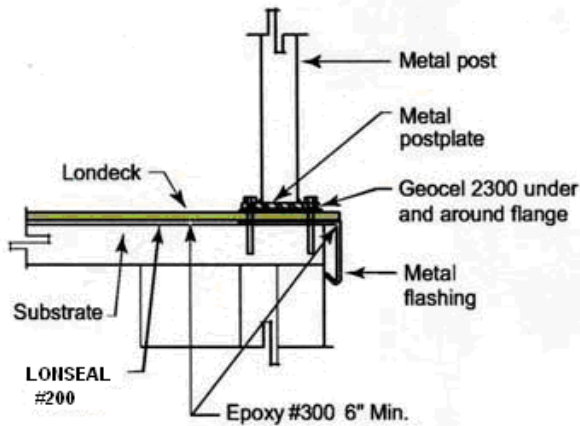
Metal Handrail and Post Detail Metal Flashing Edge
